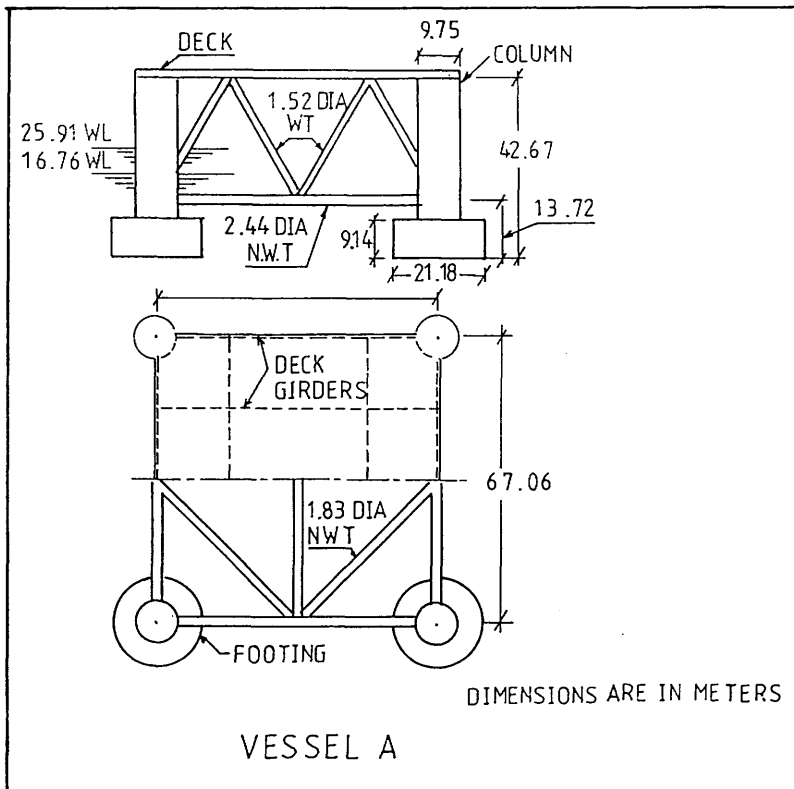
4-column footing type semi-submersible design^[16]
